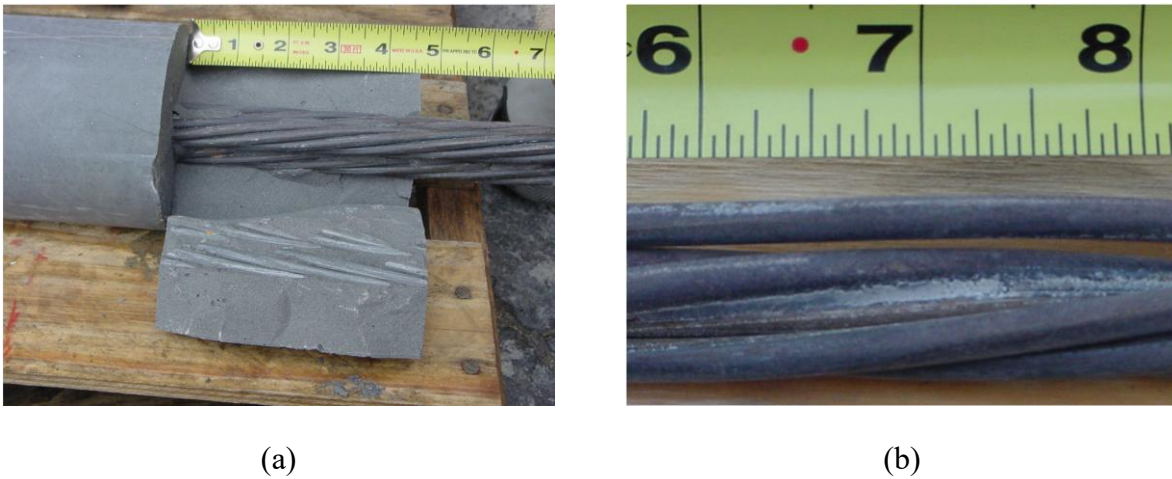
Examination of dissected specimen: (a) intact bond between grout and outside tendons; (b) grout penetration into the strand interstitial spaces. (Alvarez and Hamilton 2002).
